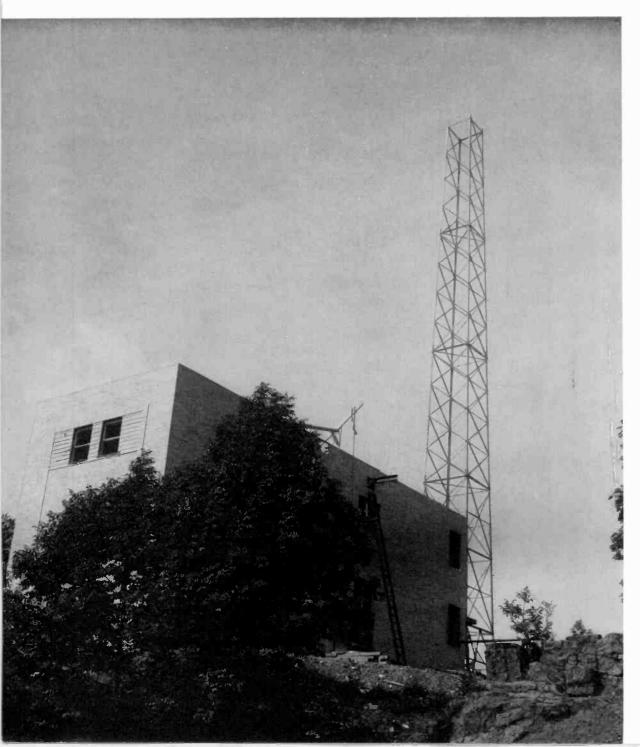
(left) This three-story brick building on top of West Orange Ridge will house WAAT-TV and WAAT-FM. 130-foot tower at the right will support a 2-section Pylon for FM and a 6-bay superturnstile for TV.
